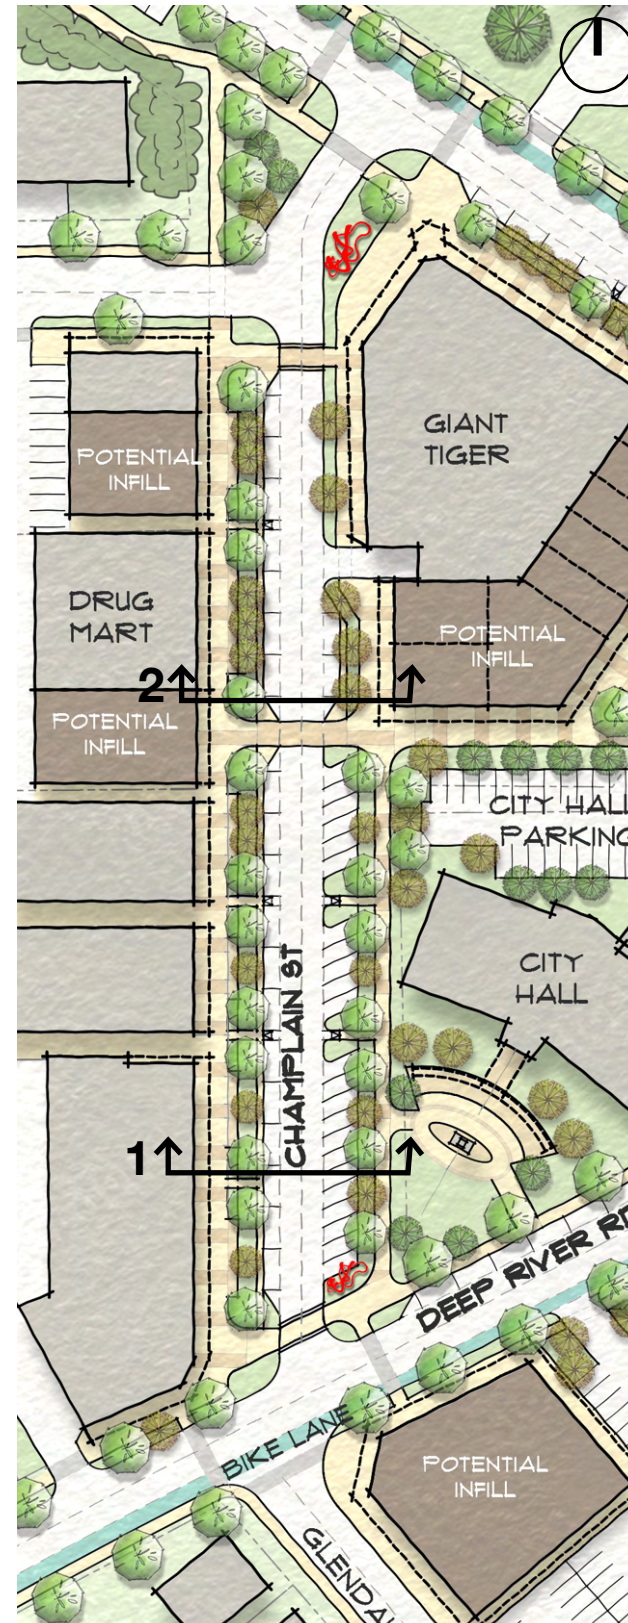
Champlain Street Concept Plan. Source: Fotenn
